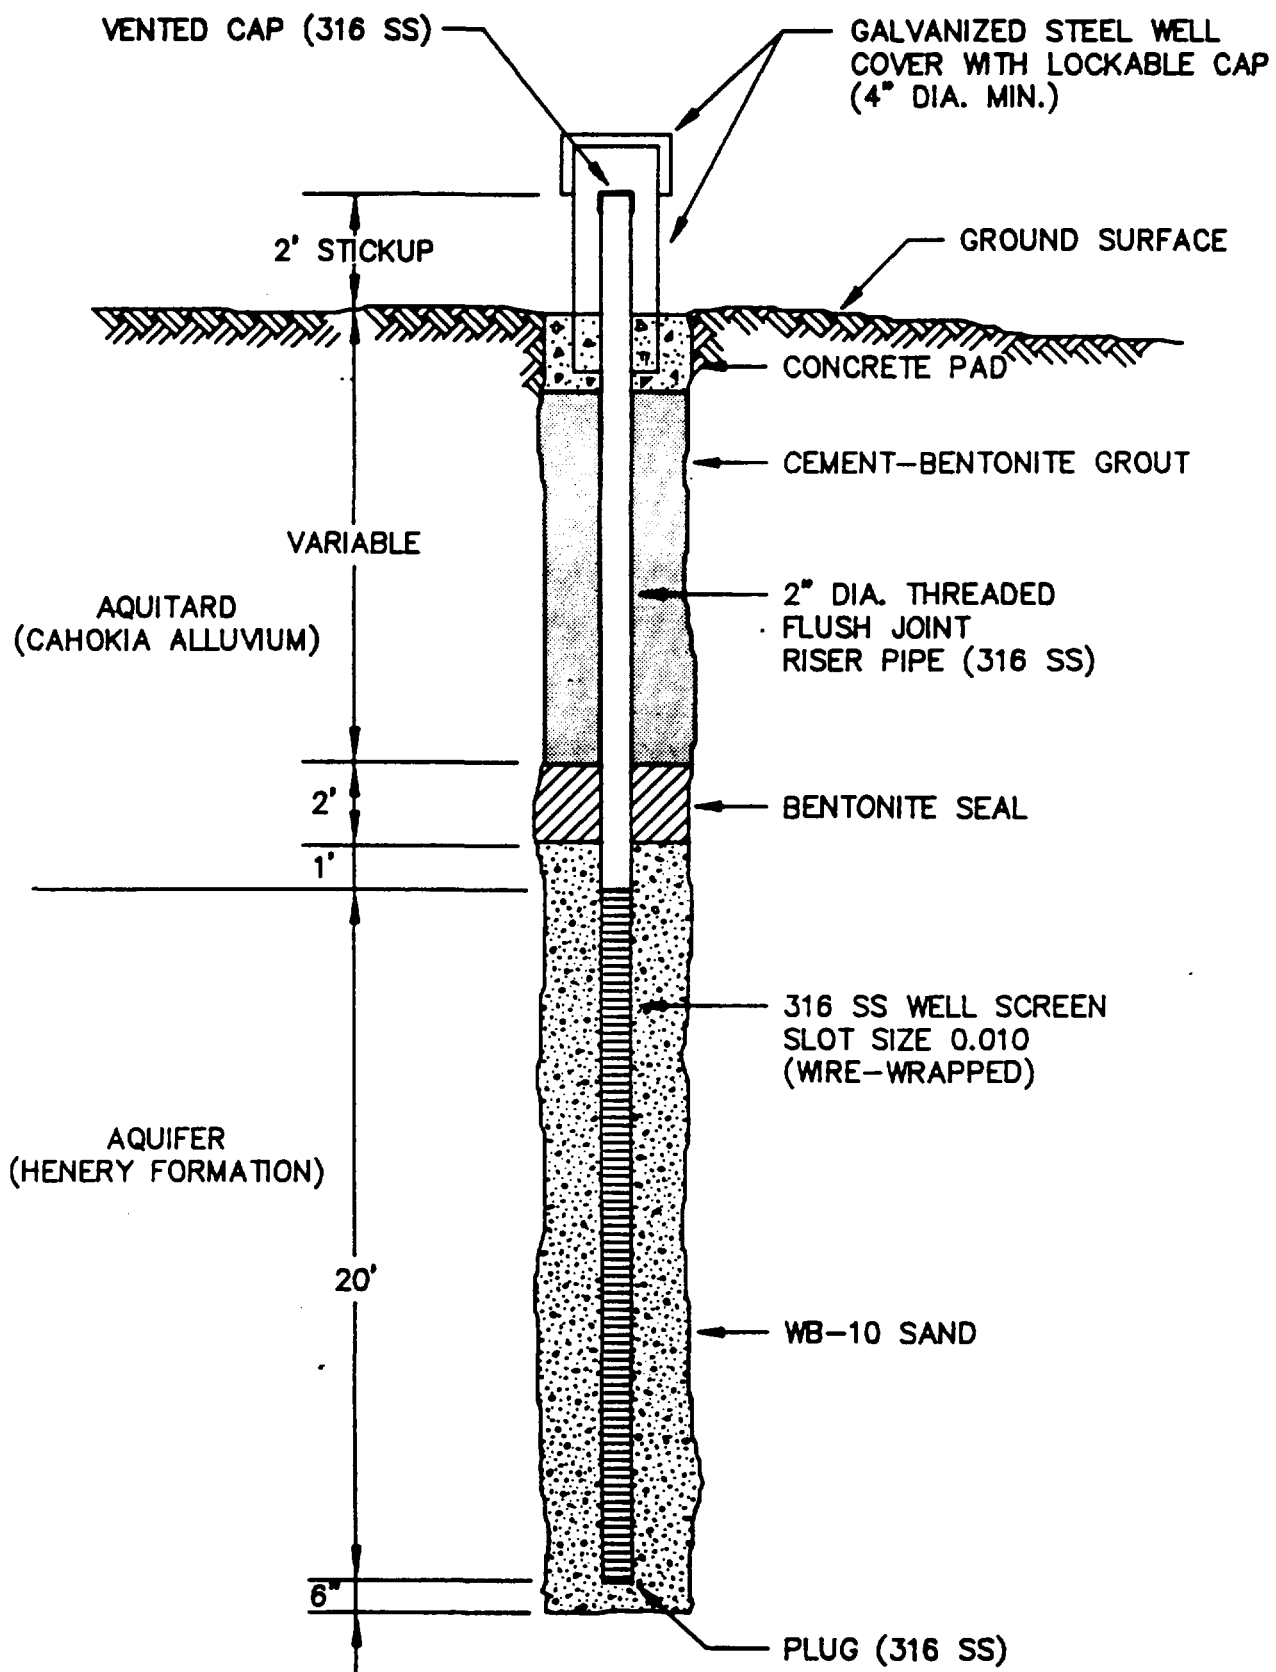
TYPICAL MONITORING WELL INSTALLATION
